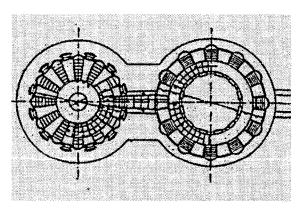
Cross-section of the towers from Plan of the Nativity façade and bell towers by Bergós.
